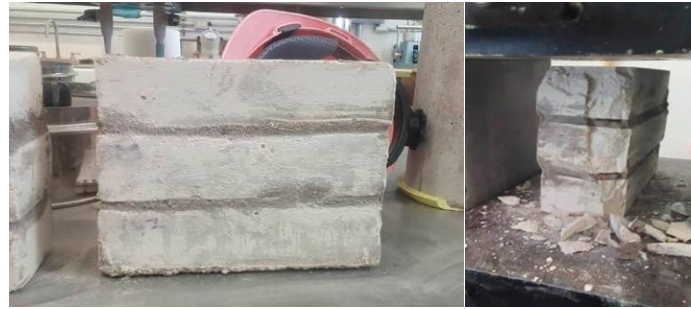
Brick masonry panels. Source: own elaboration (2018). CC BY-NC-SA
